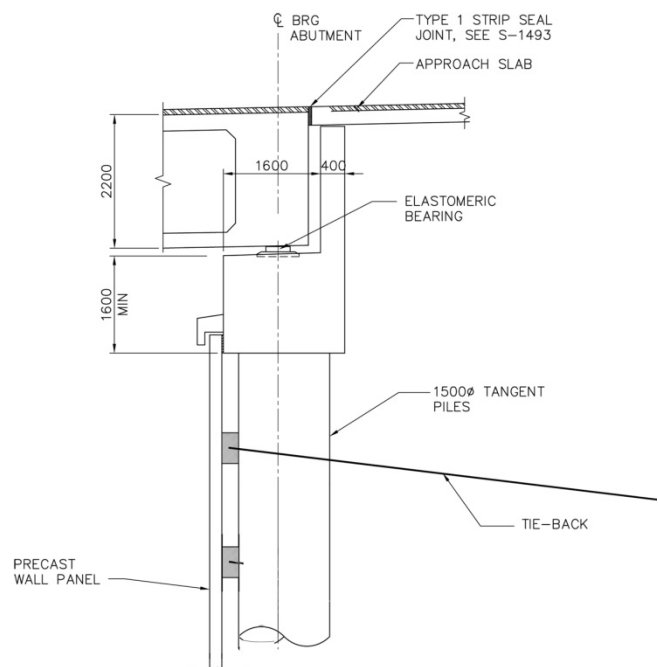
Tangent Pile Wall Tie-Backs in SR3
